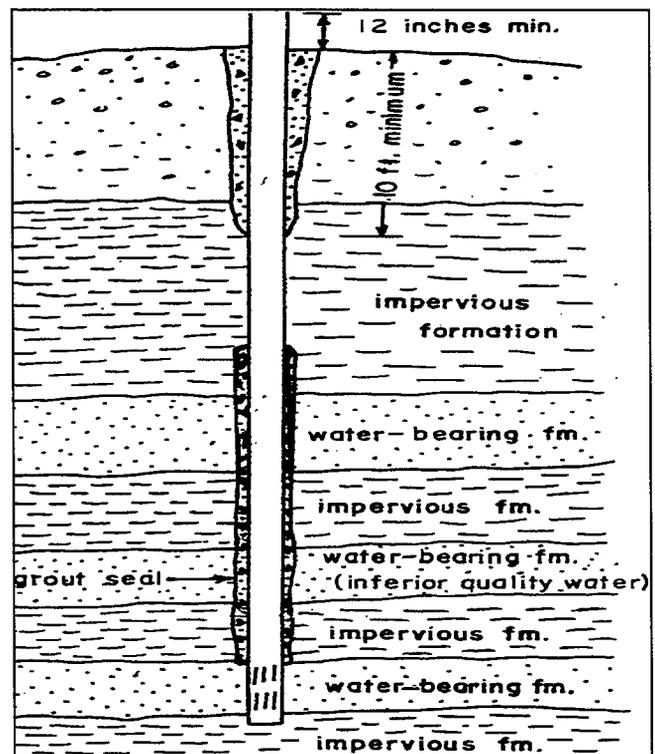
Construction of Well Encountering Multiple Water-Bearing Zones
